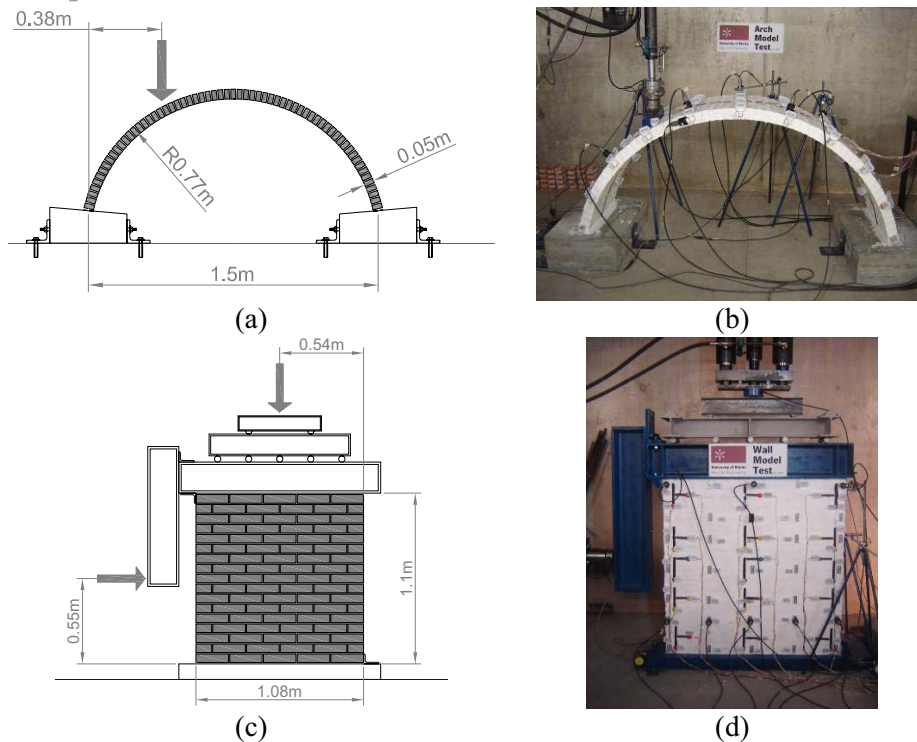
Masonry replicates: (a) and (b) the arch model; and (c) and (d) the wall model
